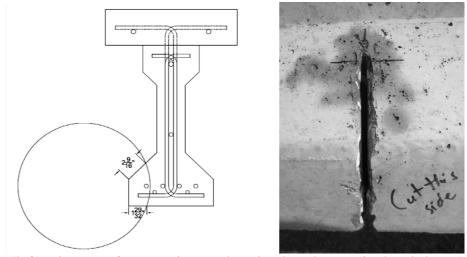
(left) Diagram of saw cutting used to simulate damage in the girders; (right) Photo showing resulting cut in actual girder sample
